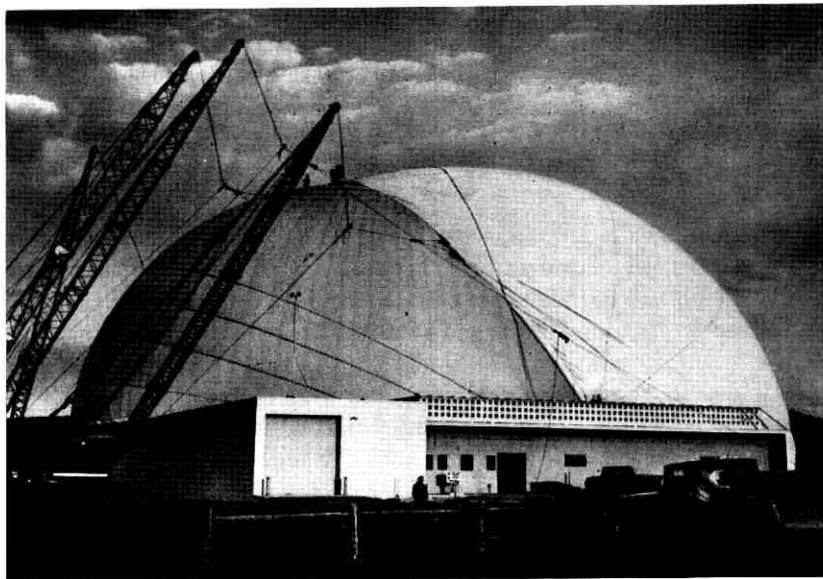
Radome being pressurized to allow sliding it over the construction shelter.
